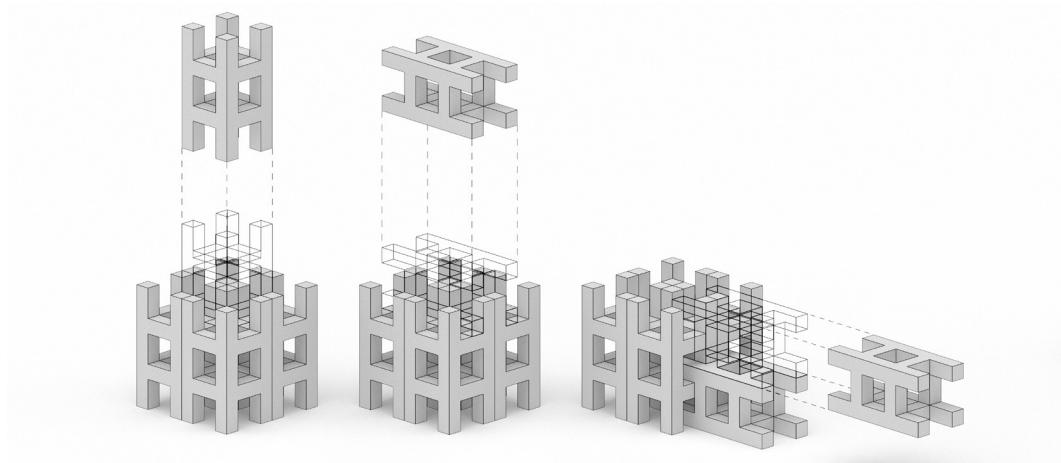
Drawing of possible H-Block assemble positions. Authors, 2023.
